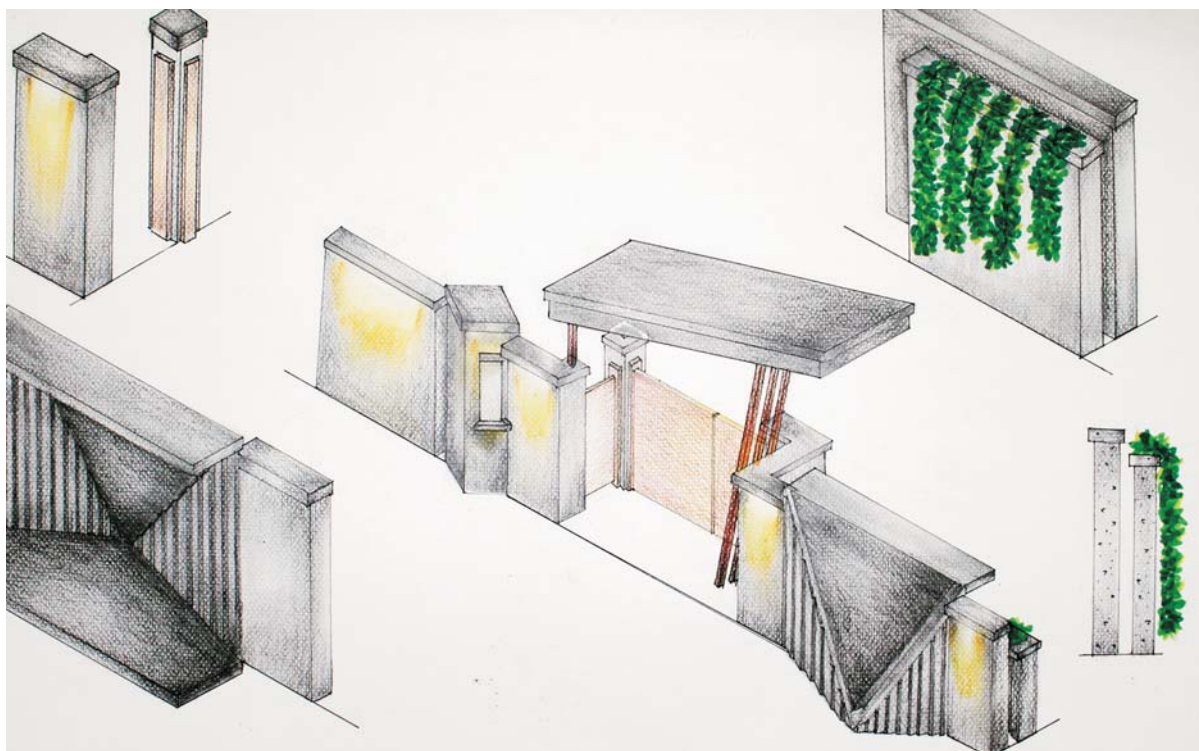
Transition from Basic Design to Architectural Design: Details of 'Boundary Wall' based on principles of Architect Tadao Ando.
